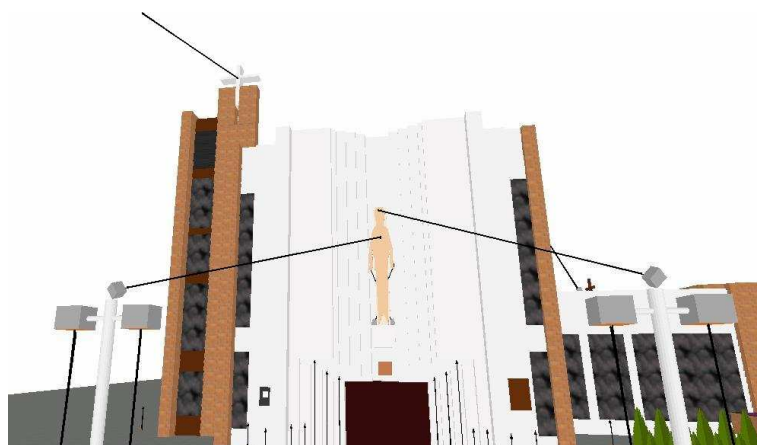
Spatial arrangement of luminaires – view of the southern facade
